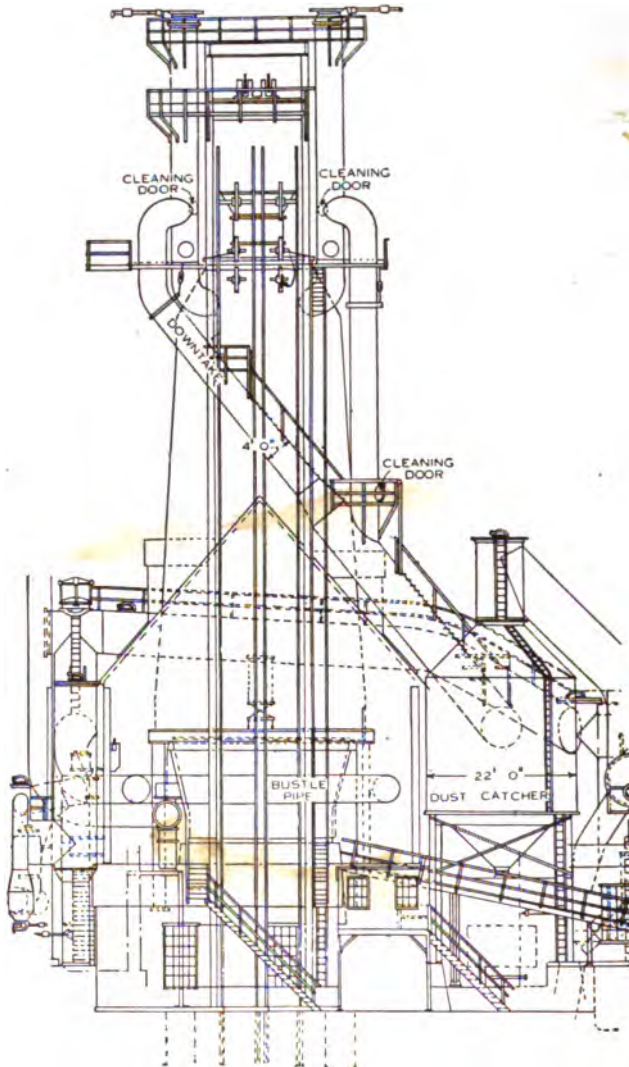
Elevation of Bethlehem Steel Company's furnace showing correct design of gas outlets.
